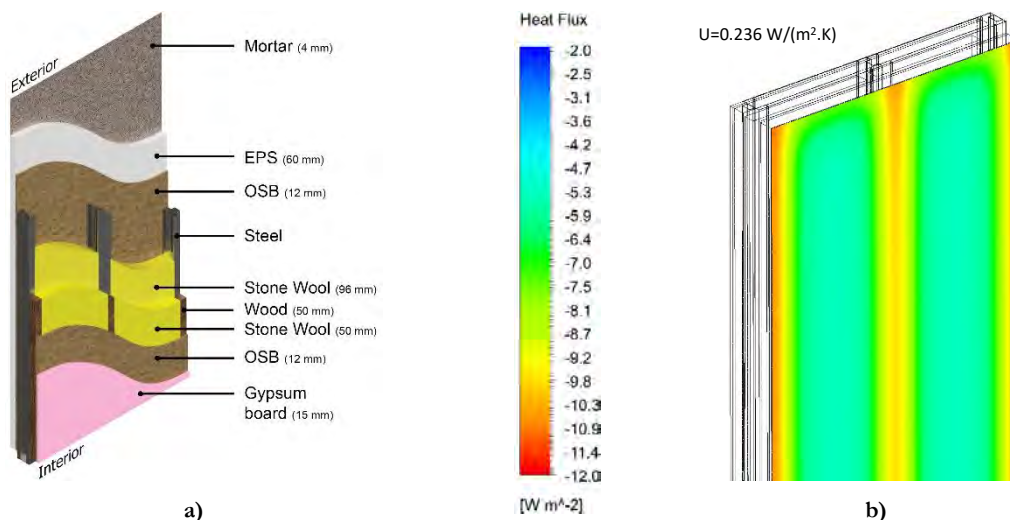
Model C with stone wool: a) Wall sketch; and b) Heat flux in the external surface of the wall.
